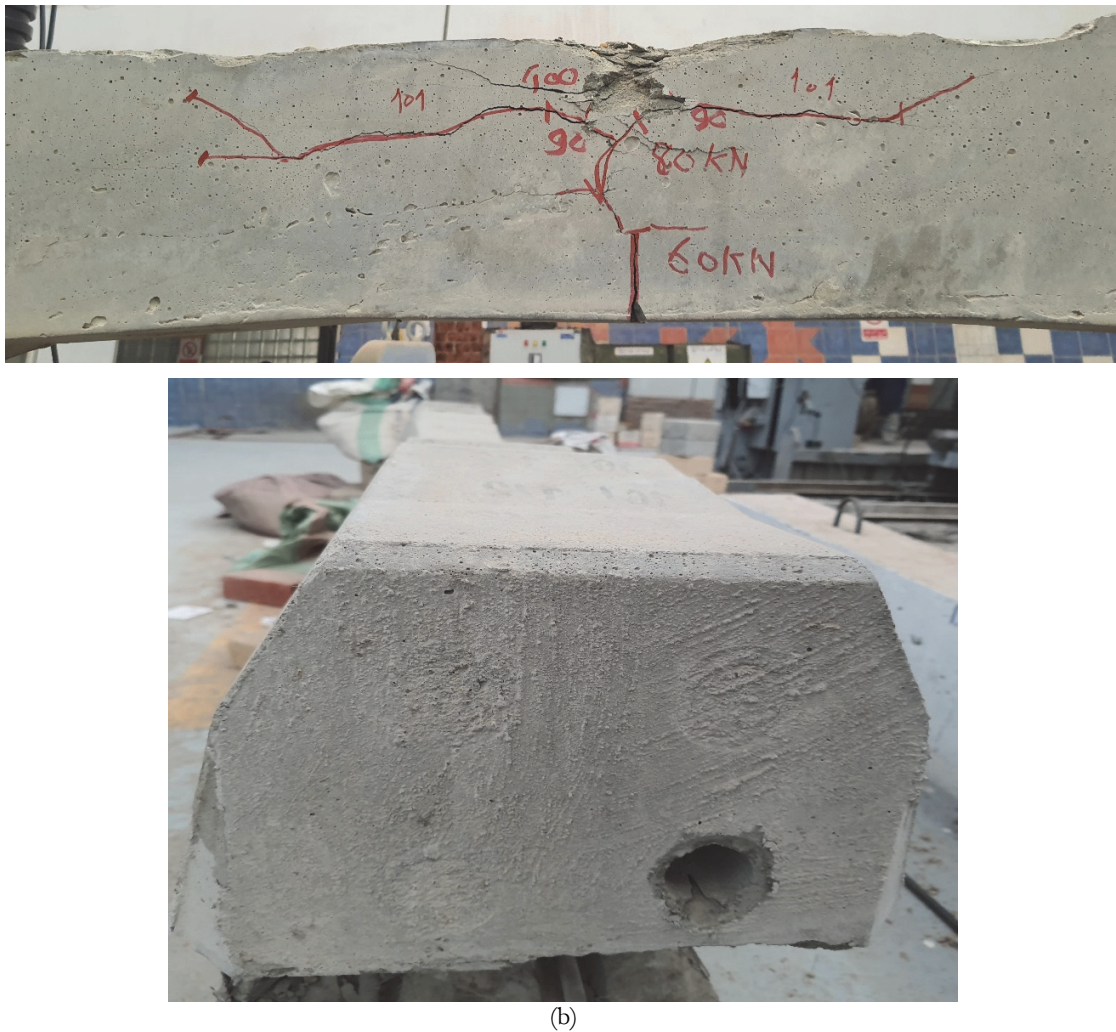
Typical failure modes of UHPC concrete sleepers at rail seat section: (a) S0-No.4; (b) S0-No.5.
